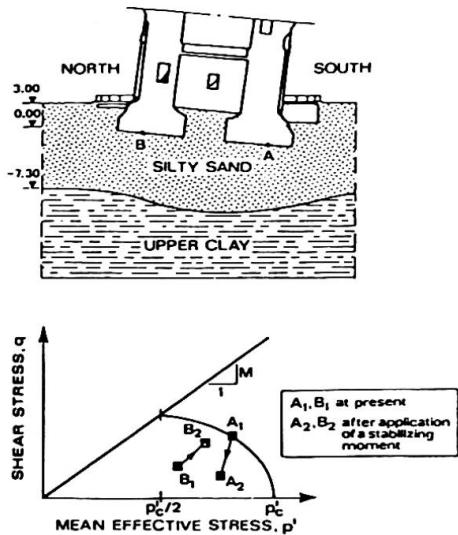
Stabilization of Pisa Tower: geotechnical solution
